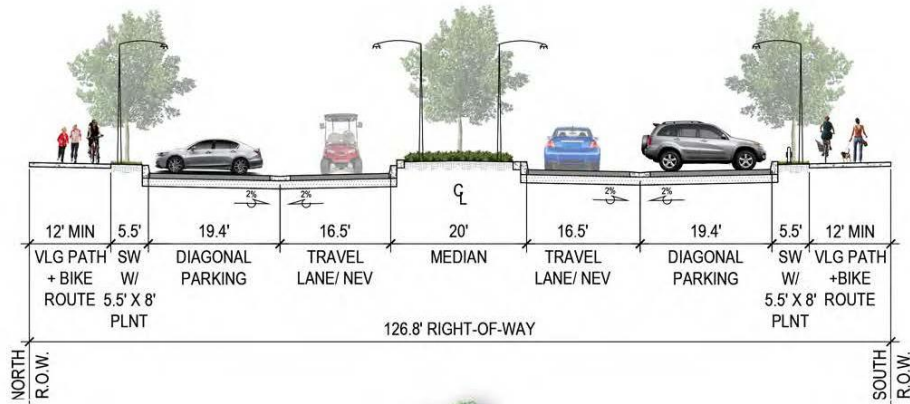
Modified Secondary Village Entry Street with Diagonal Parking
